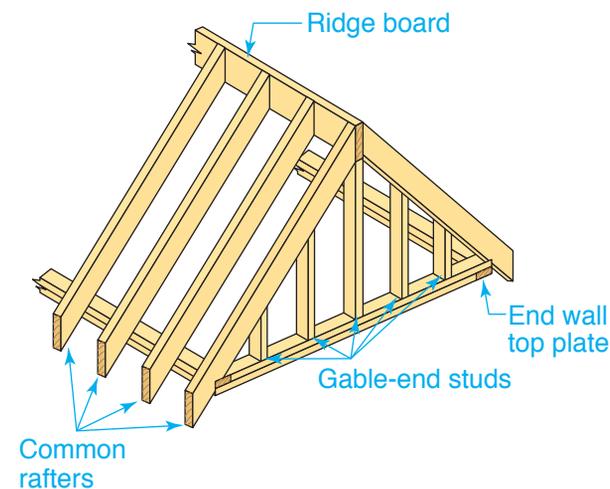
Non-Structural Gable End Filler Studs The only purpose for these studs is to provide support for roof sheathing, so this is not a bearing wall.
